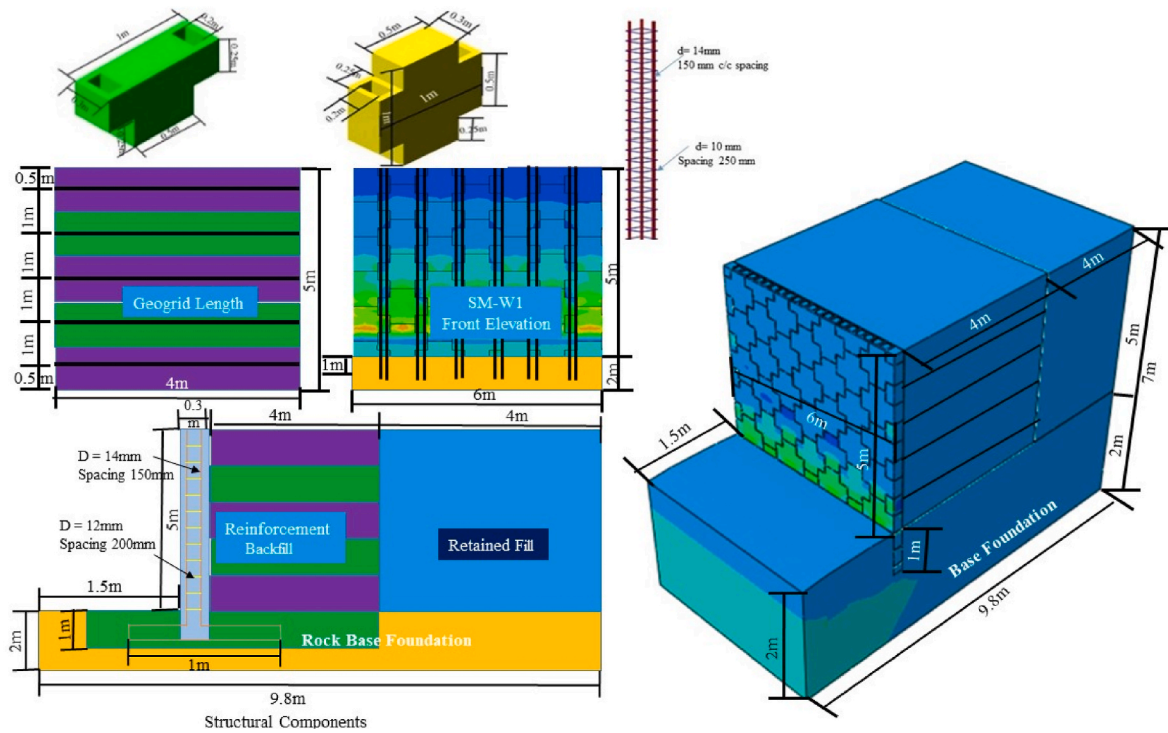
Overview of 3D model precast hollow concrete structural components of GER wall.
